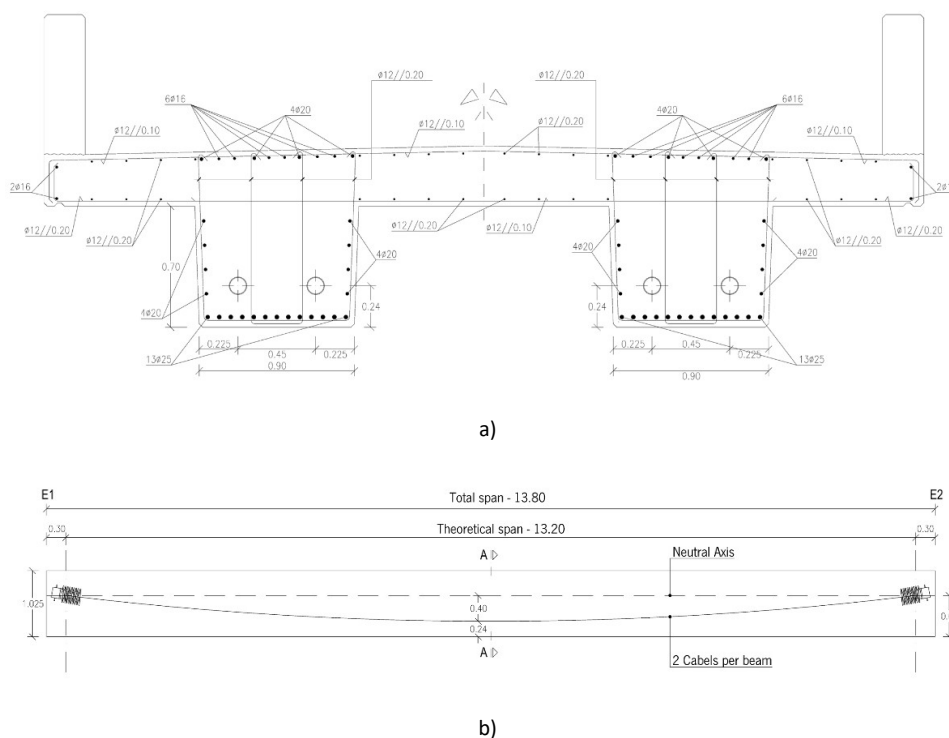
Bridge Reinforcing: a) Reinforcing steel; b) Pre-stressing, dimensions in [m]
